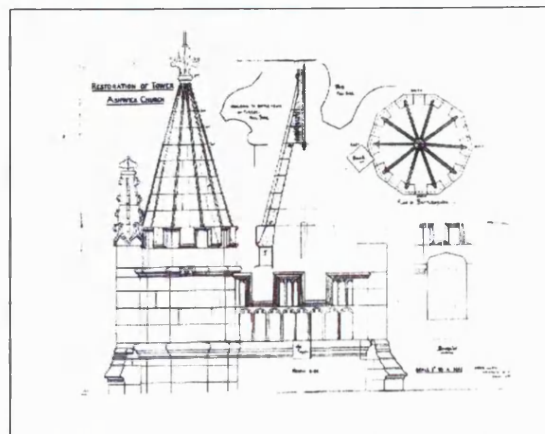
St. James's Church, Ashwick. Details of Restoration of Tower including new battlements. Signed Browne & Gill August 1880. [Browne's drawing, now in partnership with Wallace Gill.]
